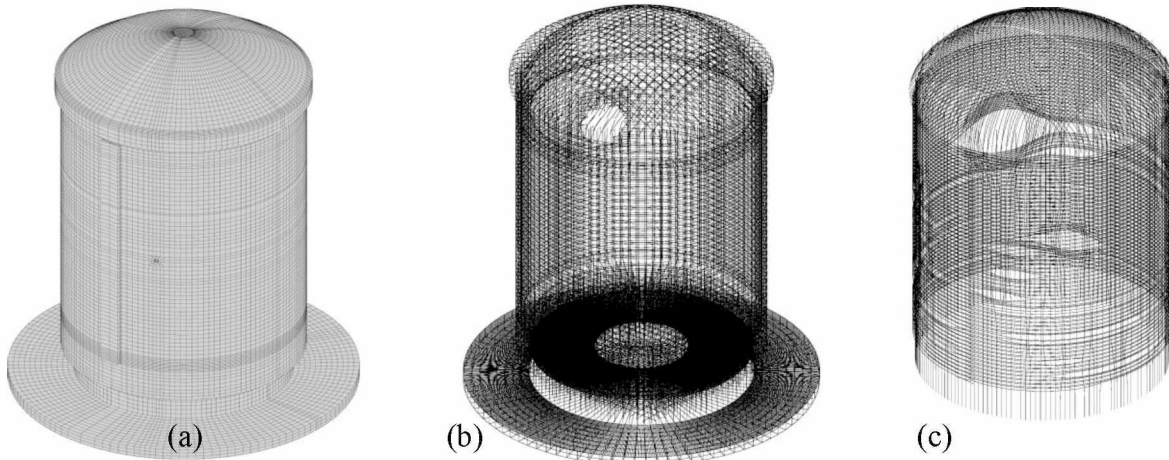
(a) Concrete; (b) Rebar; (c) Tendon
